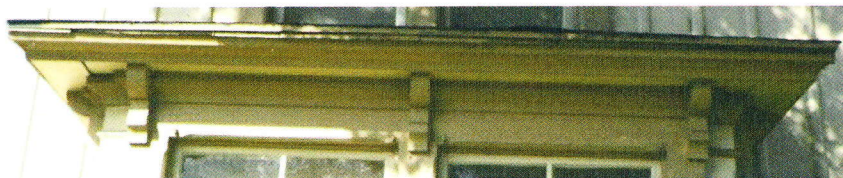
2524; Photo Date: January, 2020; Camera Facing: N
